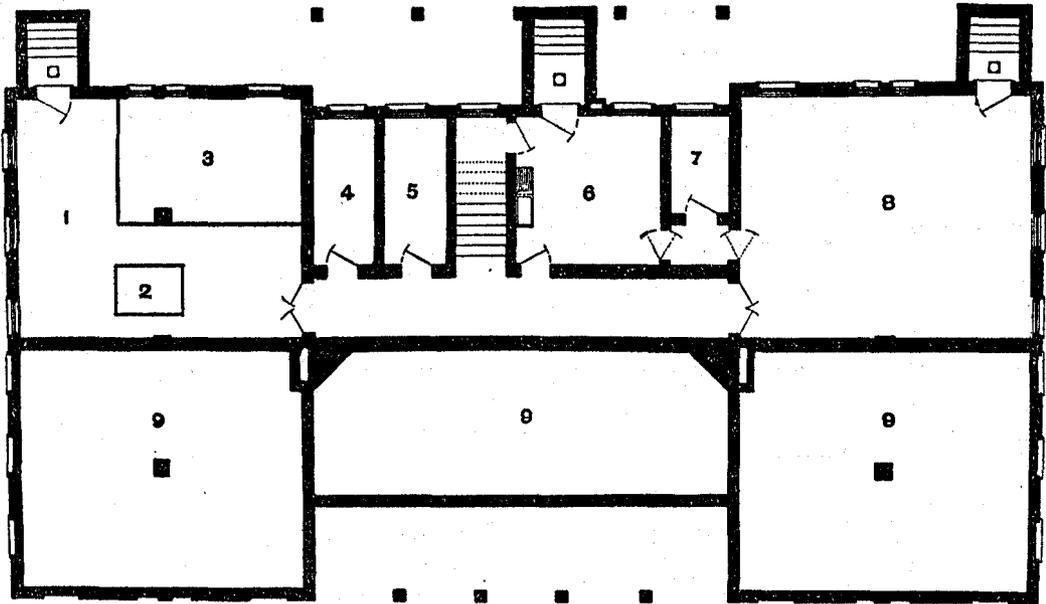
Plan of basement of laboratory. 1, Furnace room; 2, steam boiler; 3, coal bin; 4, store room; 5, toilet; 6, kitchen; 7, pantry; 8, dining room; 9, not excavated.
